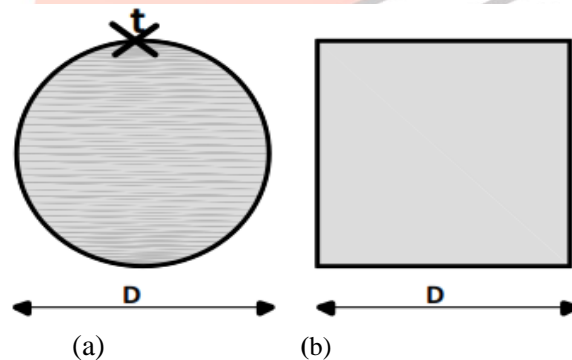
(a) Circular concrete filled steel tubular column (b) Square concrete filled steel tube column.
